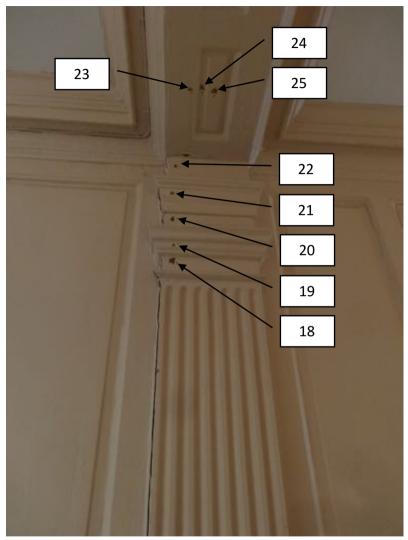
Location of Samples 18-25 on east wall pilaster and architrave
